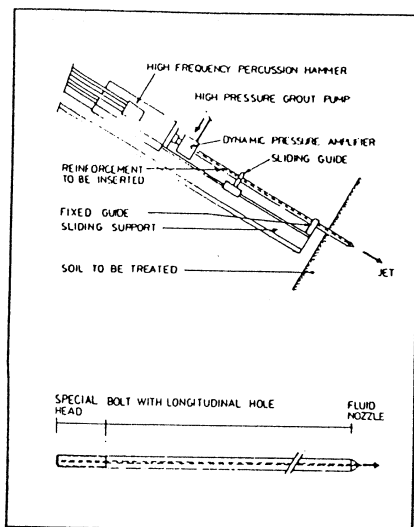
The "Jet Bolting" technique for soil nail installation which combines vibro-percussion and high grout pressure at the nail tip (Louis, 1984)
